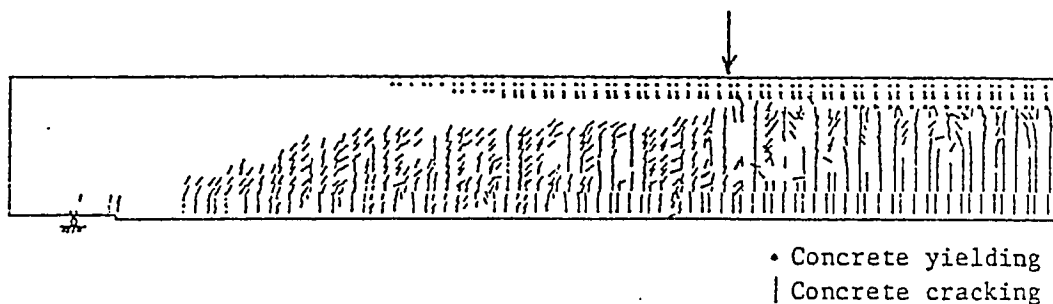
Zones of concrete microcracking and compression yielding for beam URB2 at a load of 41 kN.
